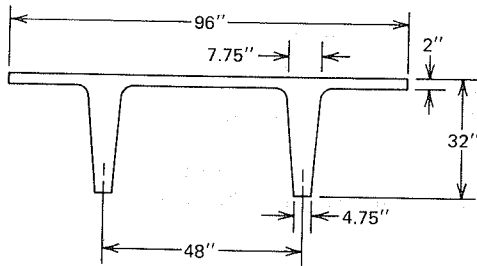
Precast prestressed double-T beam (standard PCI 8DT32 section).
